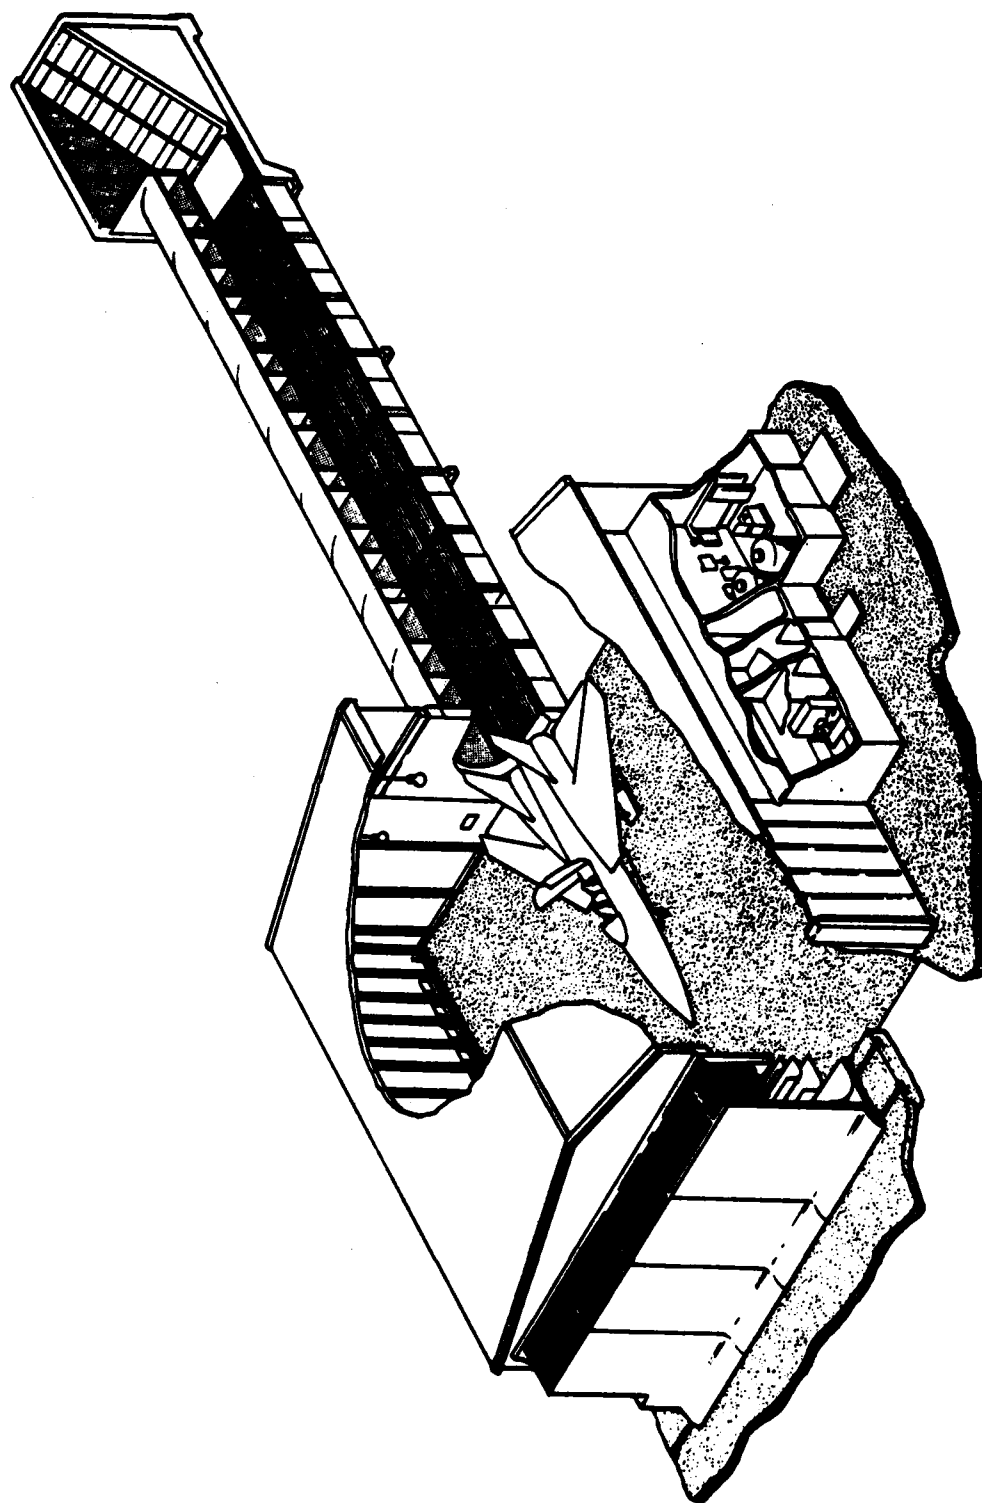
Cutaway -- acoustical enclosure with augmenter tube.
